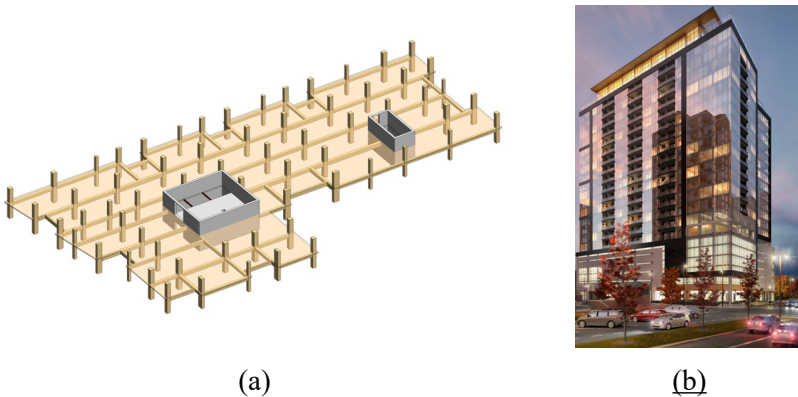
(a) *Wooden and reinforced concrete load-bearing system (Fernandez et al., 2020)*, (b) *façade perspective of the building (Cover, 2020)
